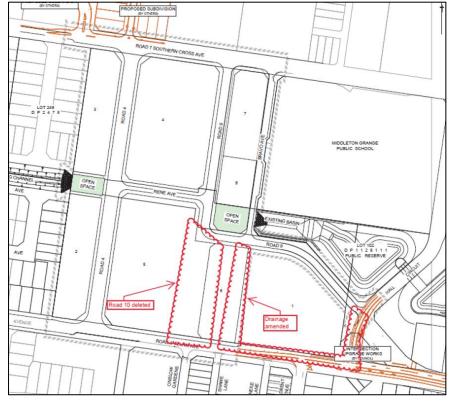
DA-64/2007/E – approved subdivision and roads design
